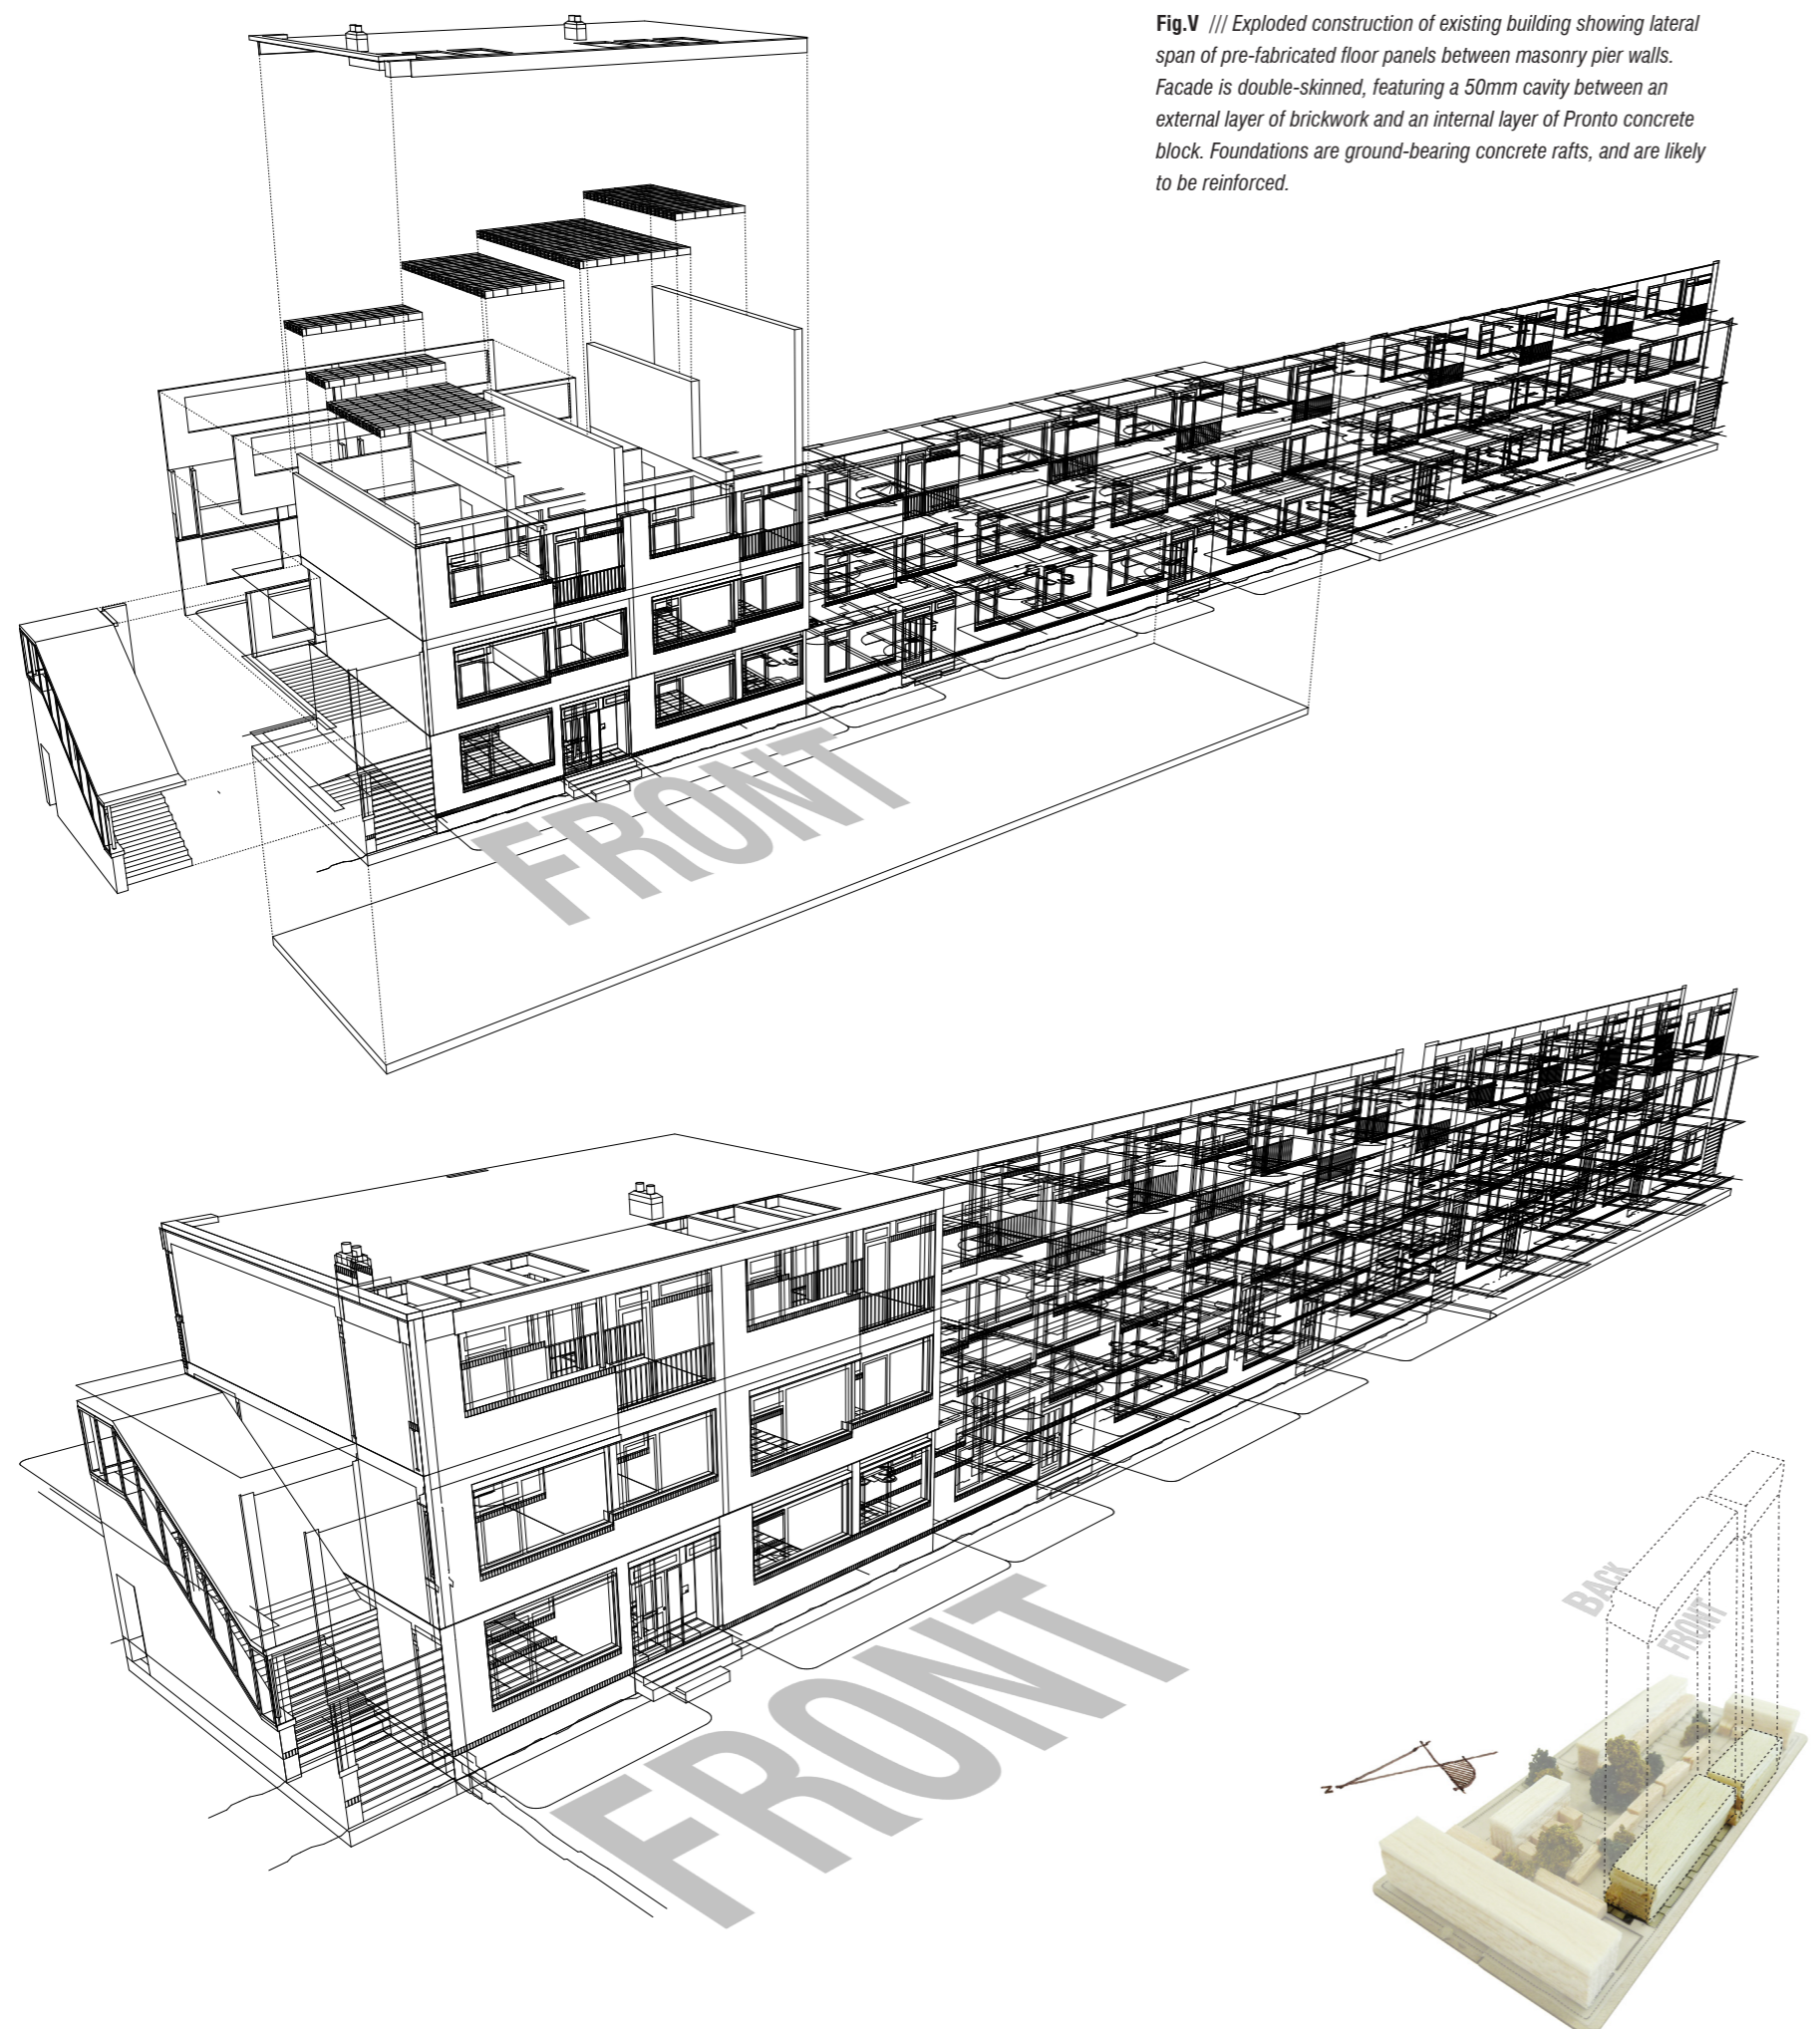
Fig.V /// Exploded construction of existing building showing lateral span of pre-fabricated floor panels between masonry pier walls. Facade is double-skinned, featuring a 50mm cavity between an external layer of brickwork and an internal layer of Pronto concrete block. Foundations are ground-bearing concrete rafts, and are likely to be reinforced.
